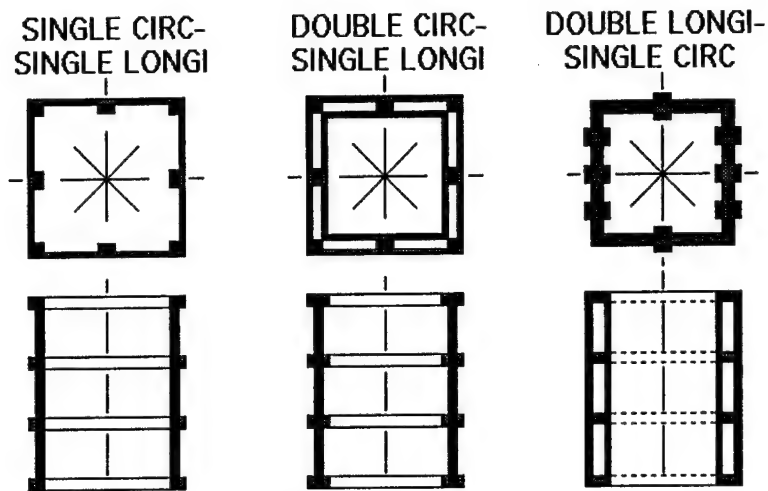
Standard designs for rectangular cylindrical stacked joint grids
